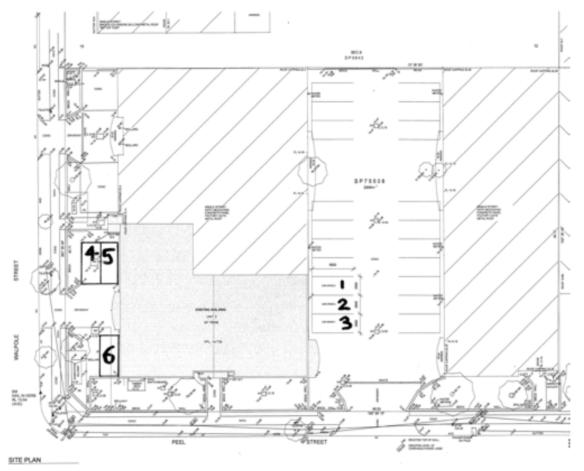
Extract from submitted site plan marked up to indicate parking spaces from the survey
